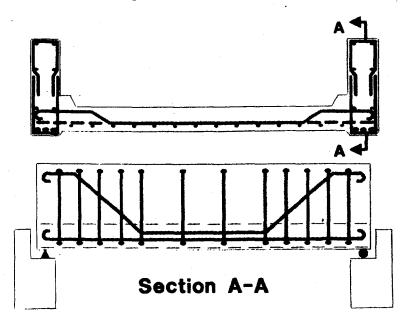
Steel Reinforcement in a Concrete Through Girder
